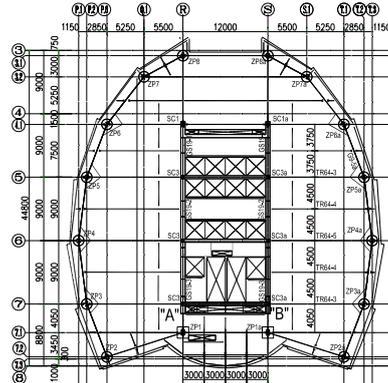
6-12F Reflection-Framing Plan-West Tower
